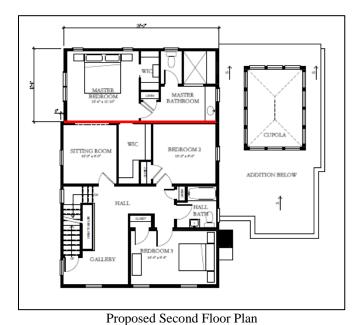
Illustrations showing walls proposed to be demolished / capsulated
